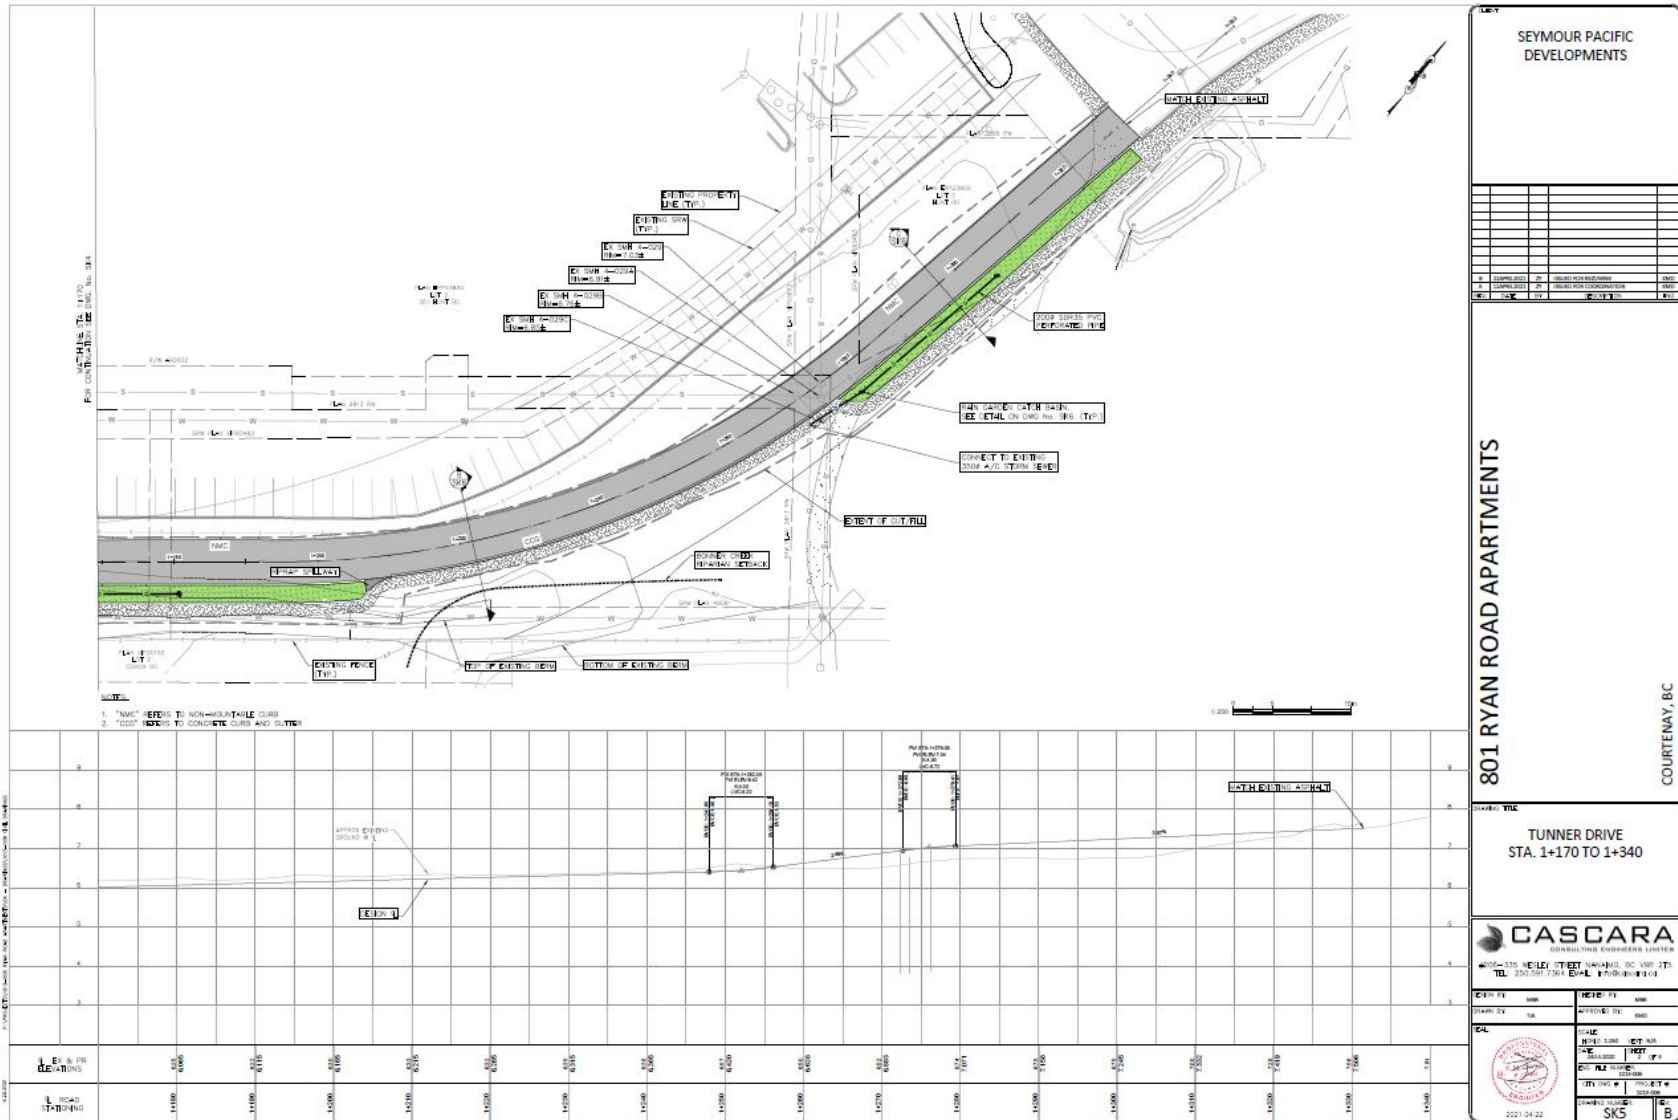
Site plan showing proposed Tunner Drive layout (Sta. 1+170 to 1+340).
